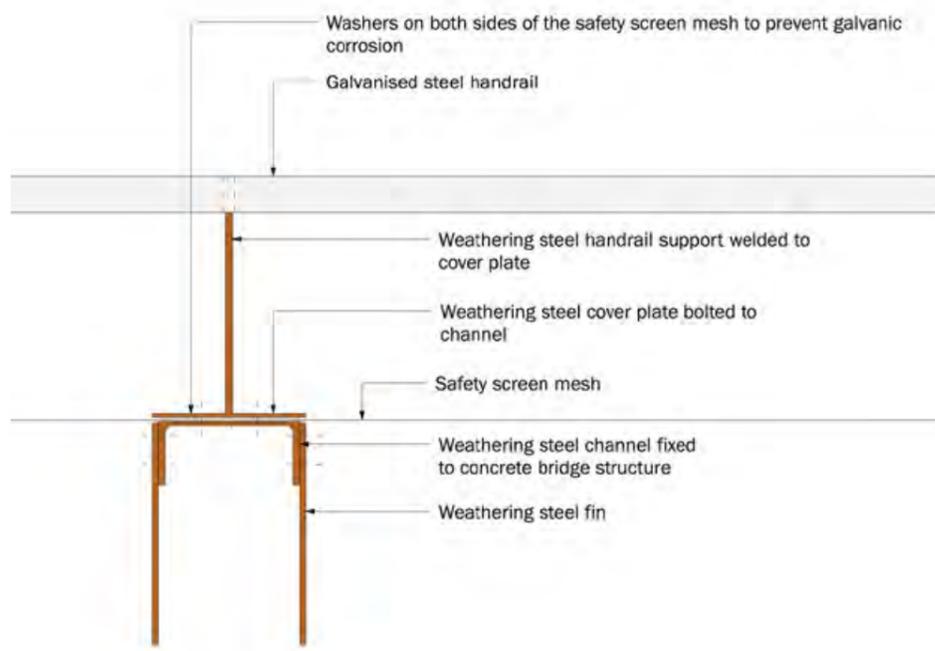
Bridge over Mount Ousley Road - Detail Section of throw screen and handrail support (Scale 1:50)
